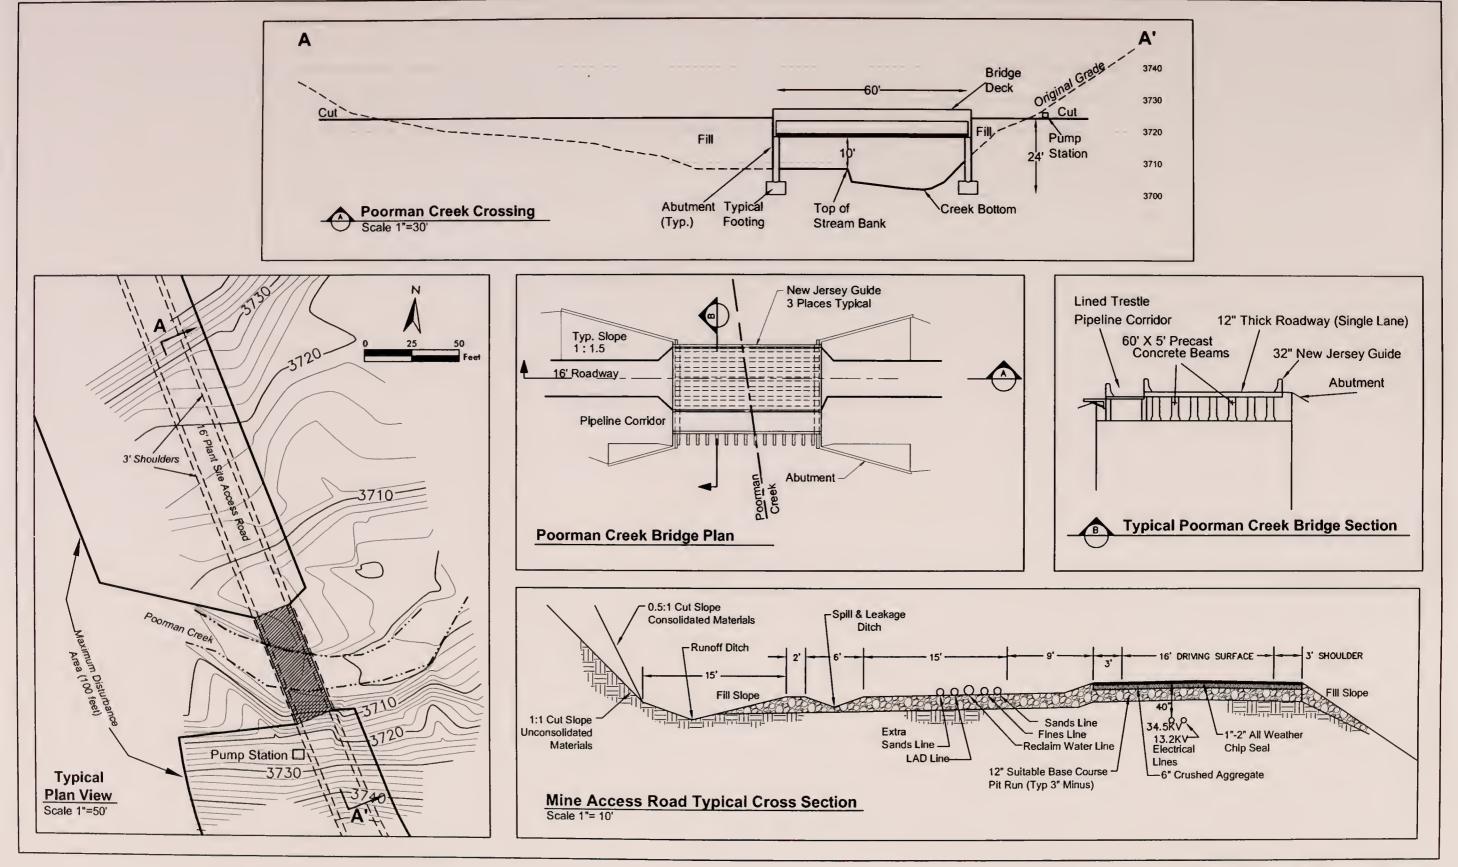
Details of Tailings Pipelines, Utility, and Access Road Corridor, Alternative 2
